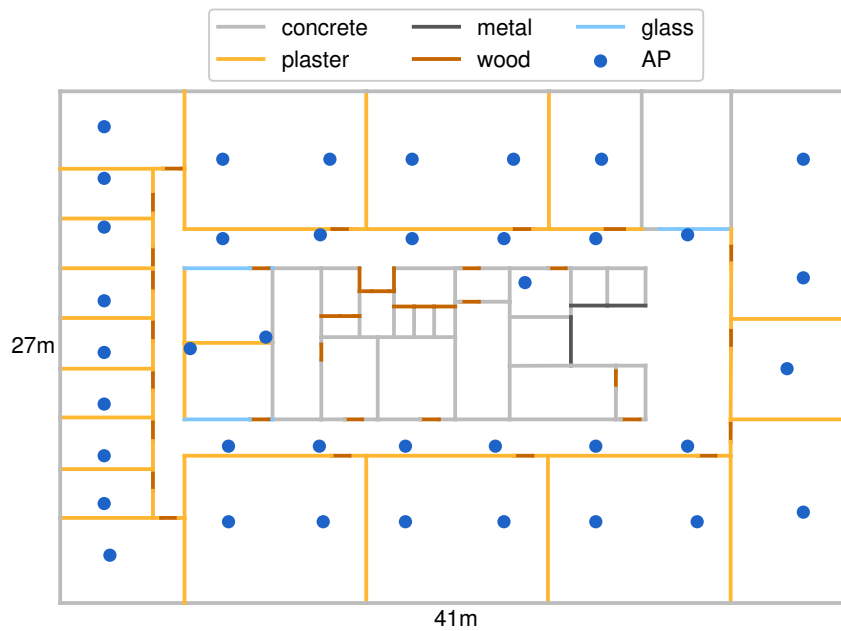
Floor plan of the office building with indication of walls, doors, and access points.
